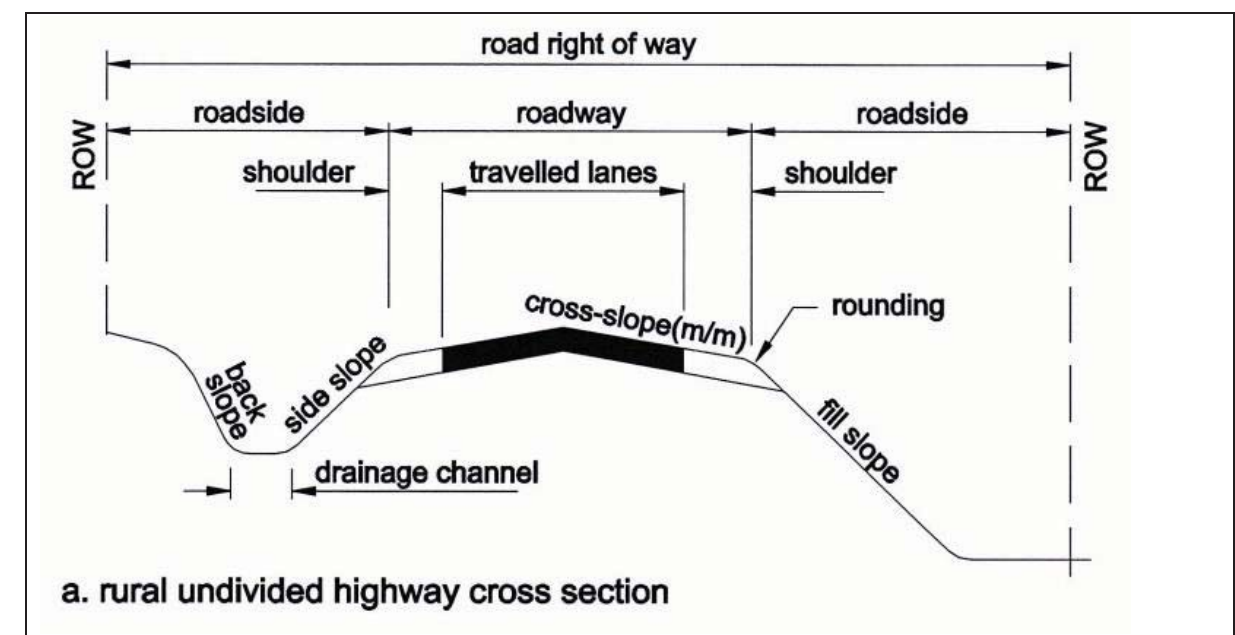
Rural Roadway Cross Section Elements (TAC, 2017)
